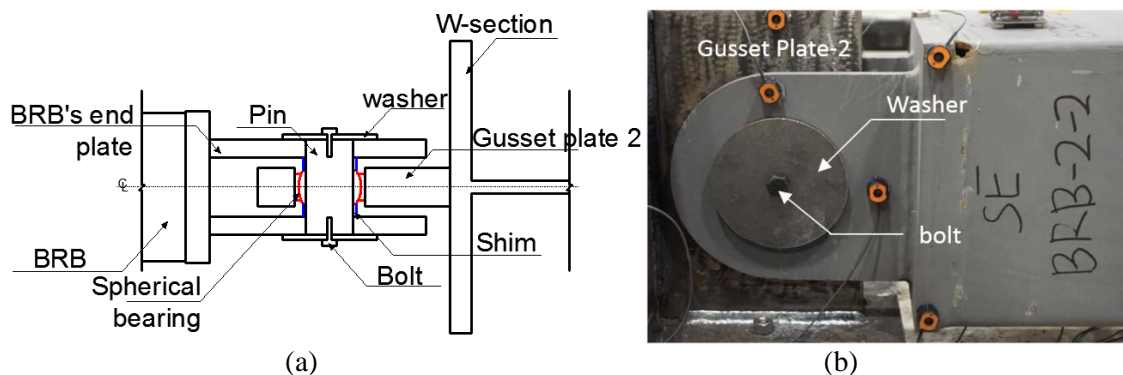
(a) Section cut view of the details of BRB-2 with Gusset Plate-2 in the reaction block using the bolt connections; (b) Side-view photo of BRB-2 with reaction block connection in test setup
